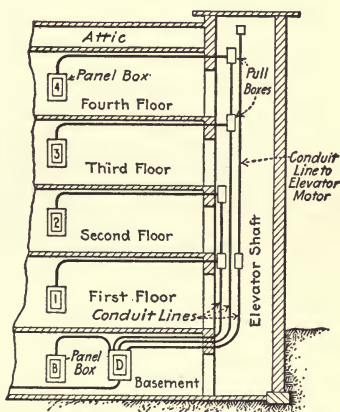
Conduit lines installed in an elevator shaft in a finished building.
